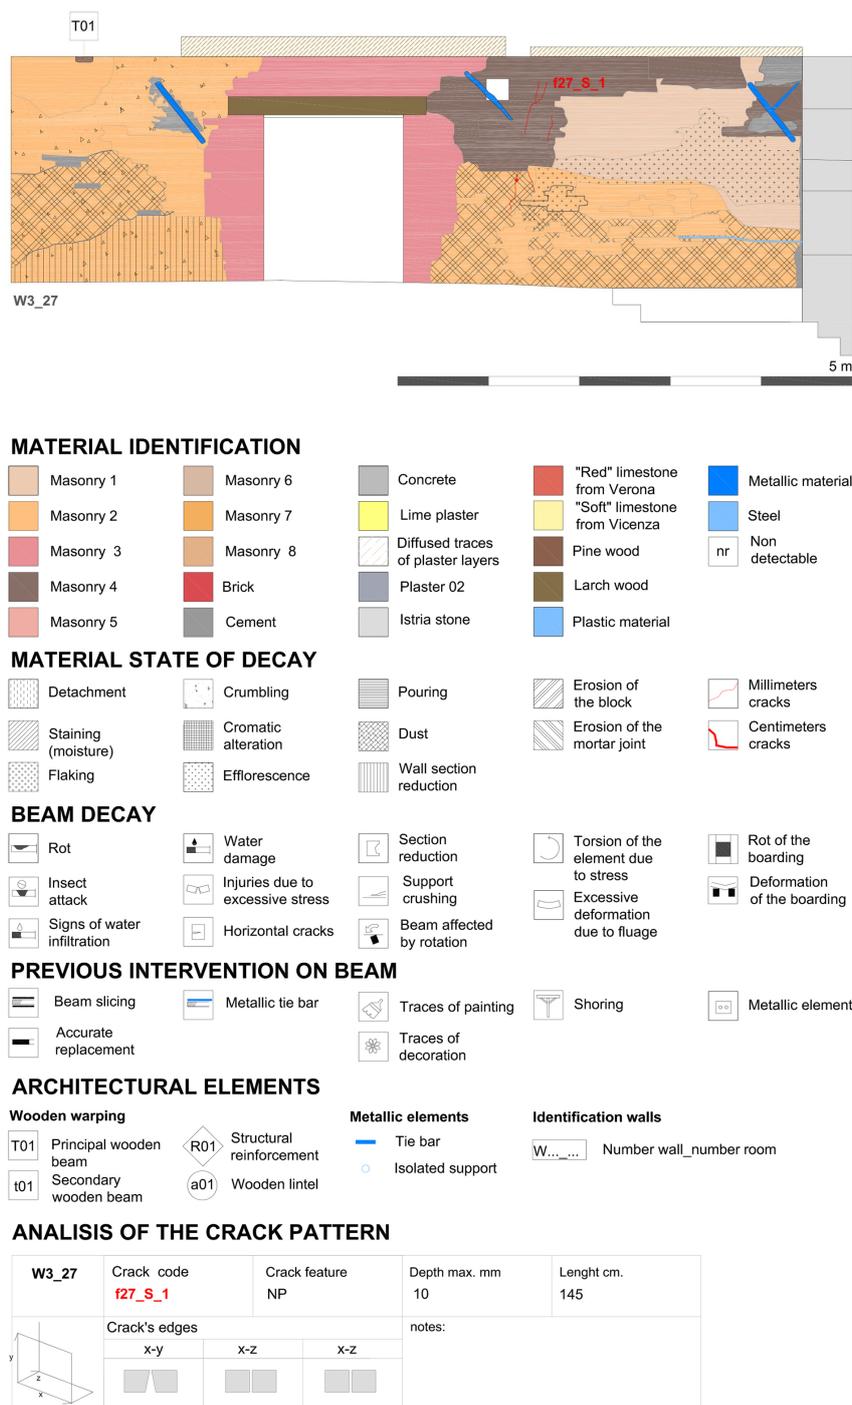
Palazzo Malipiero, Venice. Wall W03_27: material and degradation survey and crack pattern.
